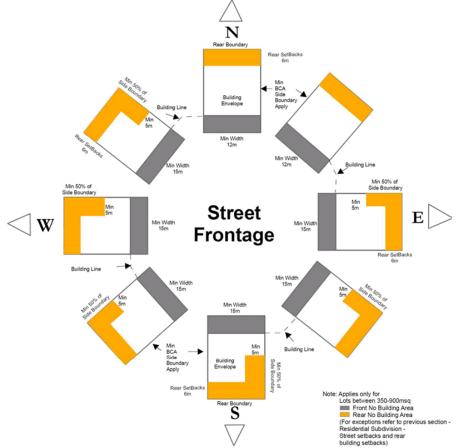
Solar Access Orientation – Minimum Building Envelopes and Lot Widths
